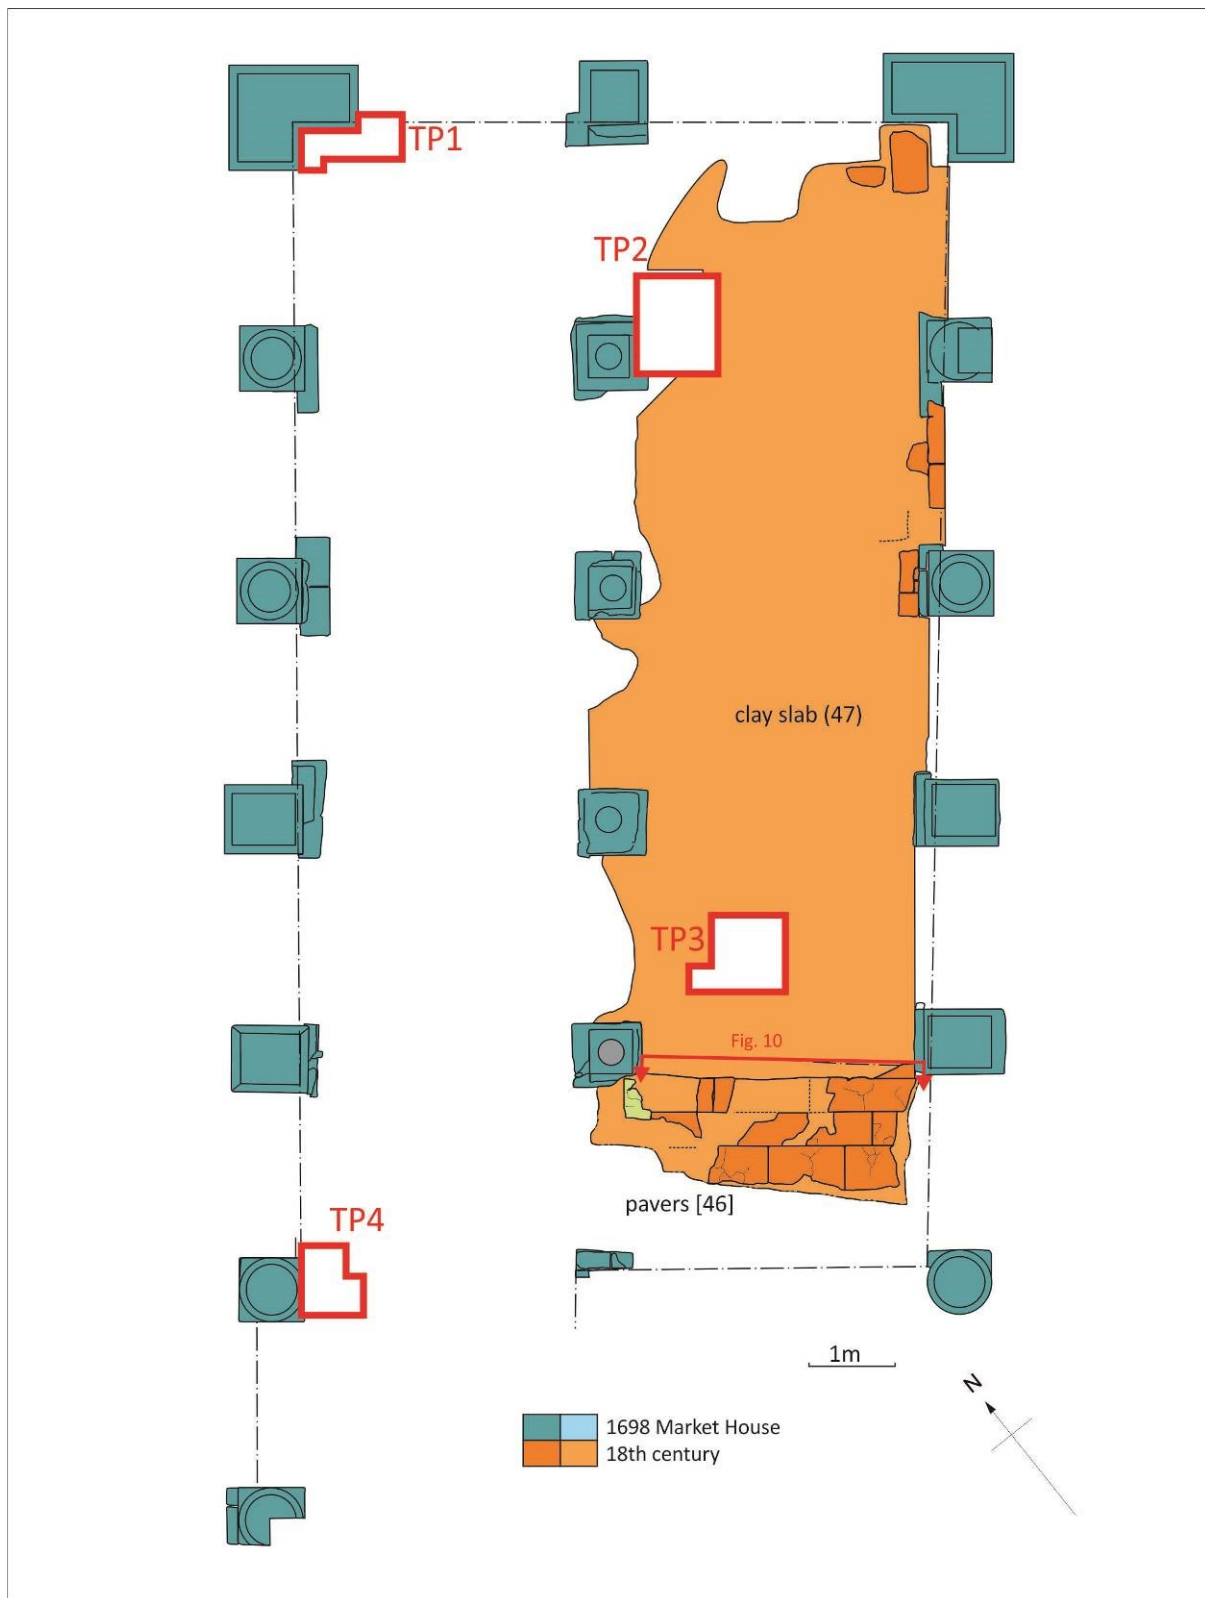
Plan of undercroft showing surviving extent of clay slab (47) and Painswick Stone pavers [46]
